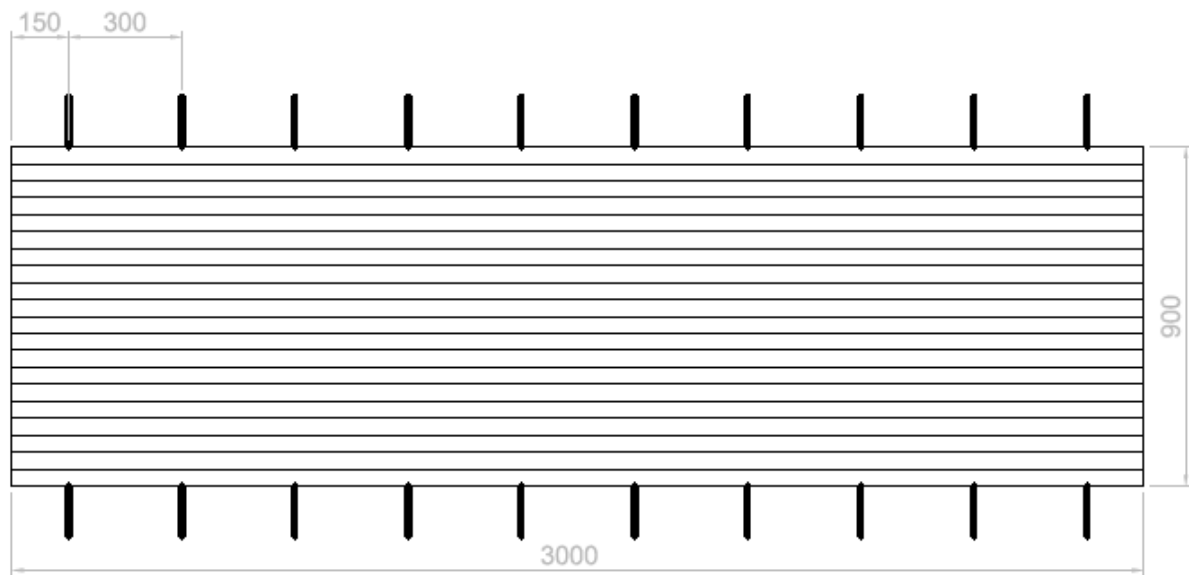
Beam composed by 20 laminations of timber C24 with 3000mm of length and 10 steel bars to pre-stress them
